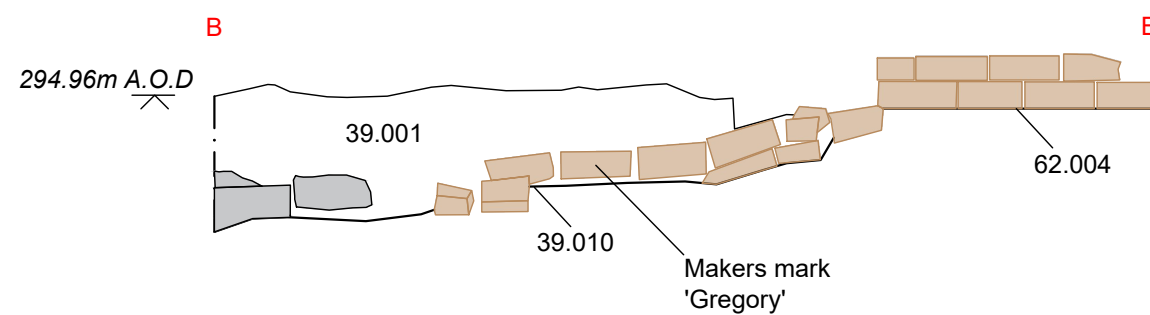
West-facing elevation of the stairs and path into Hut 62
